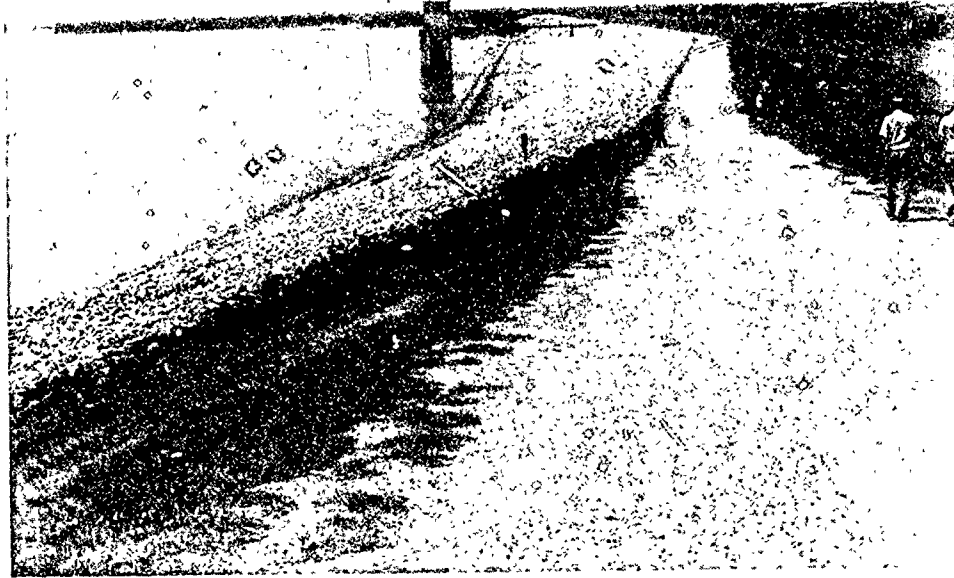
Looking at the U/S ripraped slope from the right abutment with outlet works tower in background, Sep. 83
